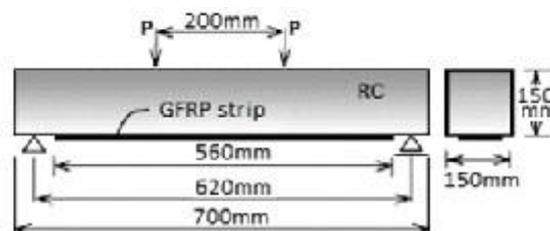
Details of the RCC-GFRP composite beam test specimens.
